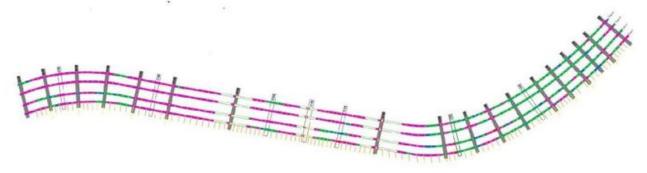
planimetric diagram of the pipes inside the bridge, with indication of the measured thicknesses
